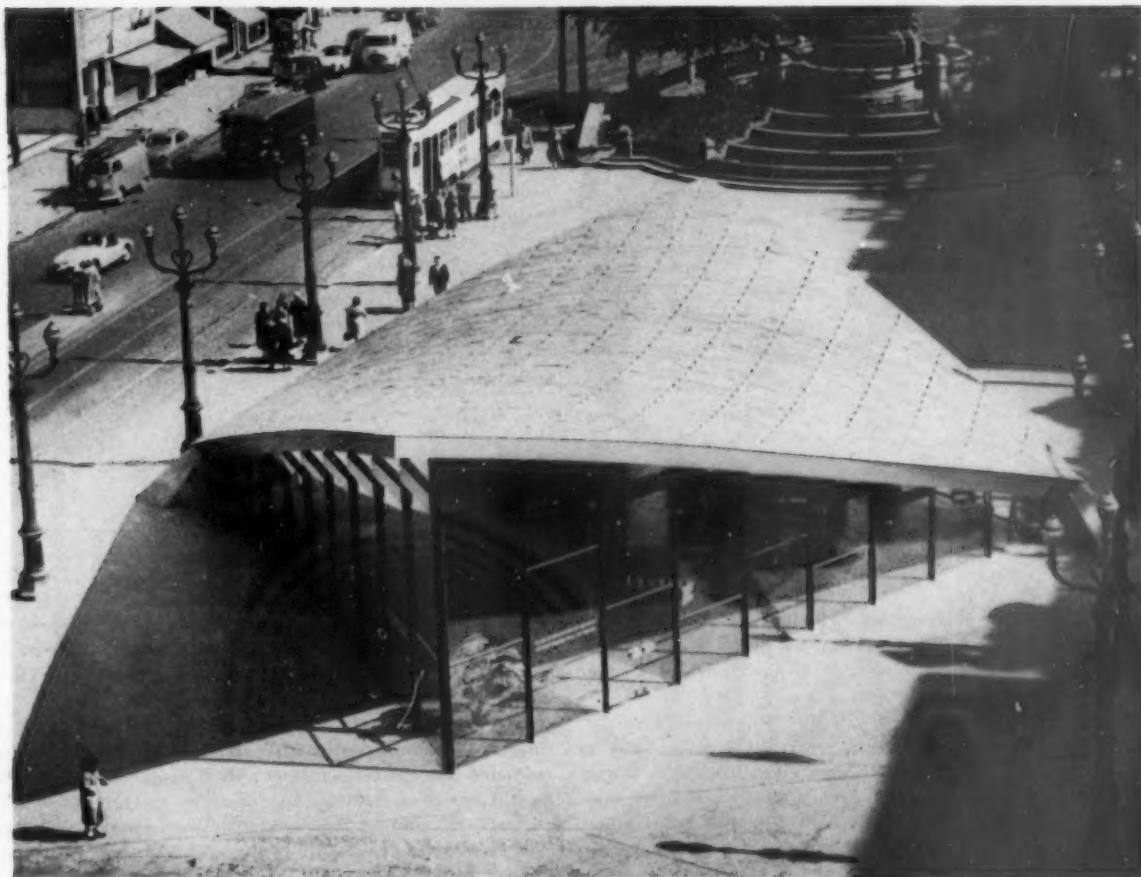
Hyperbolic paraboloid roof over Information Office, Brussels
